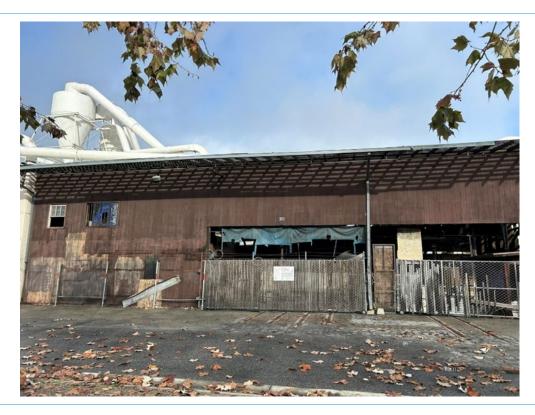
Overview of "hopper" feature at east elevation of structure, facing northwest.
